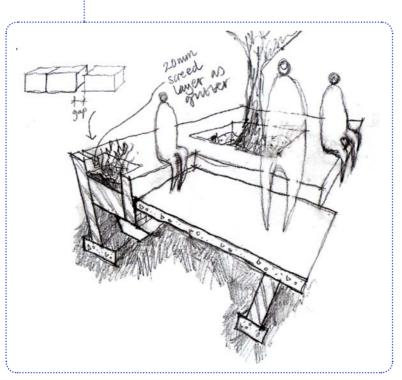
Proposed brick planters and concrete slab planters. (Author: October 2013)
